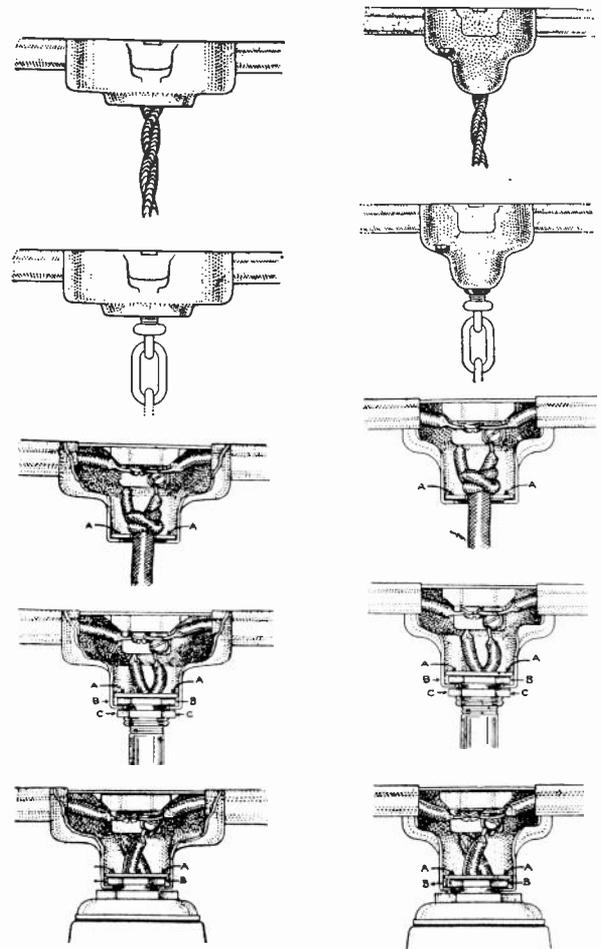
The above views show a number of styles of fittings used with metal molding and the method of making connections for fixtures. Note the connector blocks used for attaching fixture wires to the running wires.
